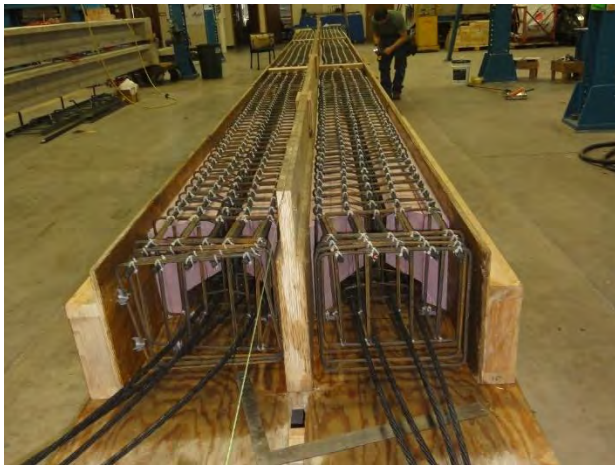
Passing prestressing CFCC strands through the reinforcement cages and connecting load cells and end couplers
